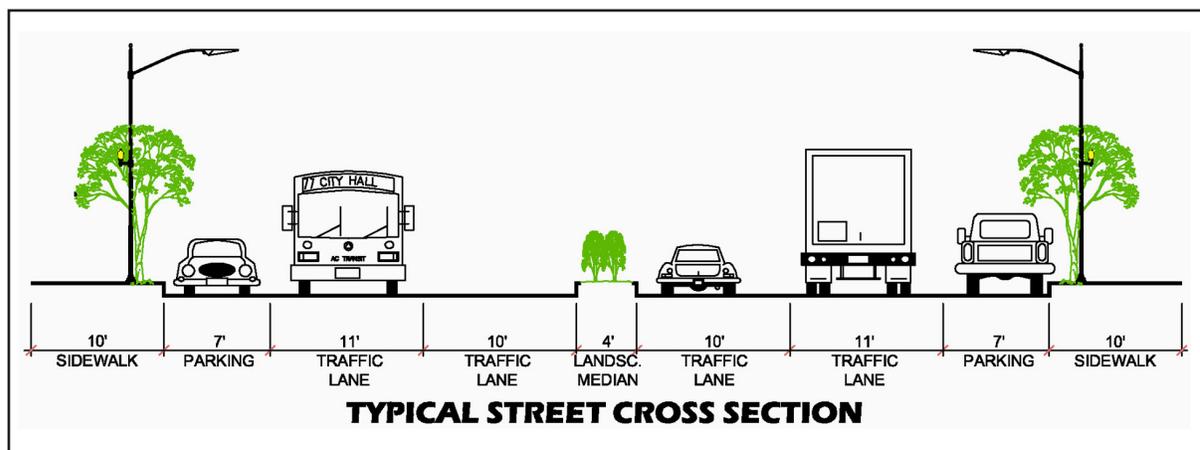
Typical Street Cross Section for Mission Blvd, A Street to Rose Street
